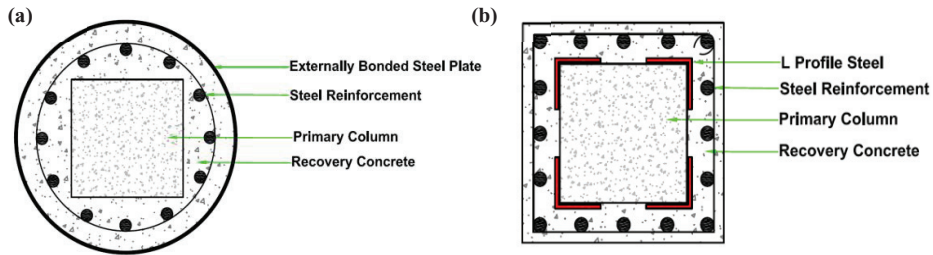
Retrofitted RC Column by (a) externally-bonded steel plate and (b) concrete jacketing considering L Profile.
